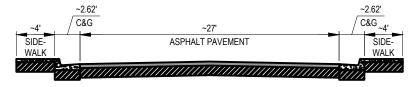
EXISTING GRANDE DRIVE TYPICAL SECTION
